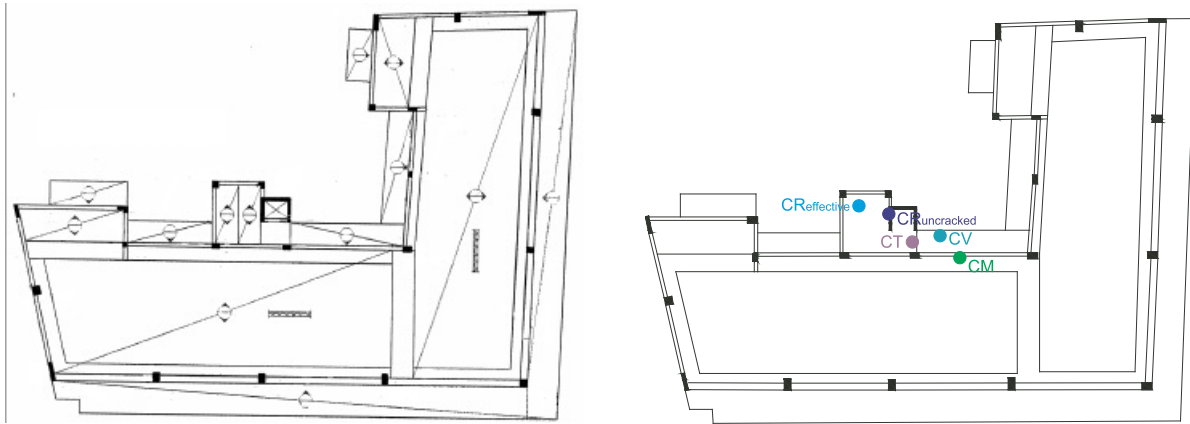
Building that collapsed during the Athens (1999) earthquake: (left) standard storey; (right) centres of mass, stiffness or resistance and pole of twist at 1st floor
